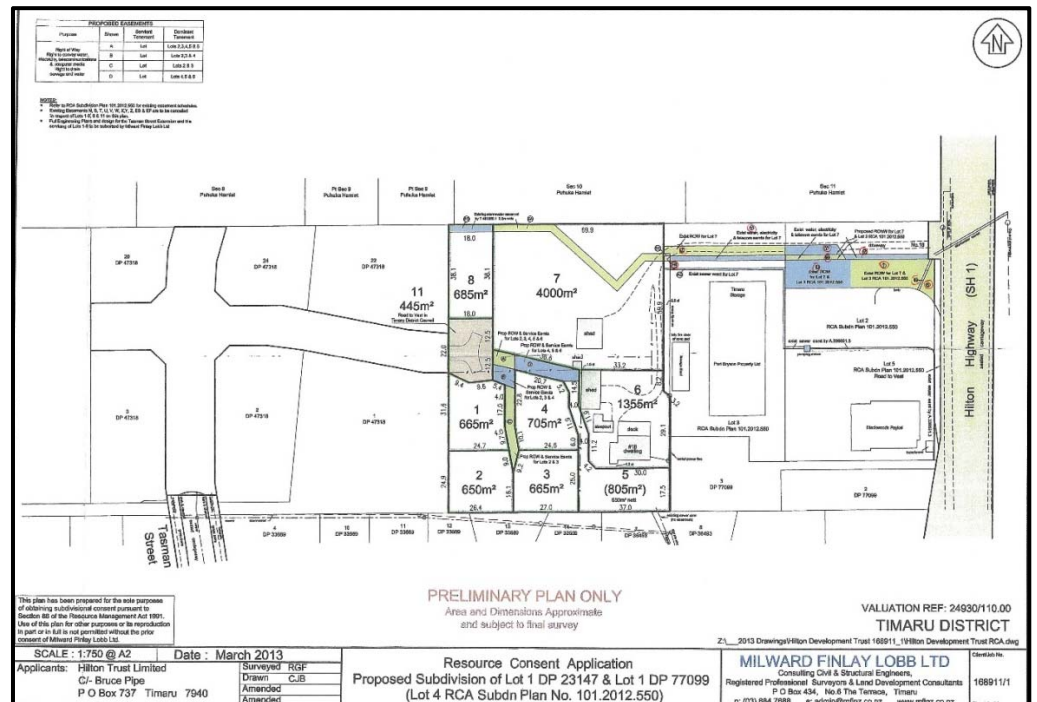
Hilton Trust Limited (Bruce Pipe) – Subdivision Consent Plan
